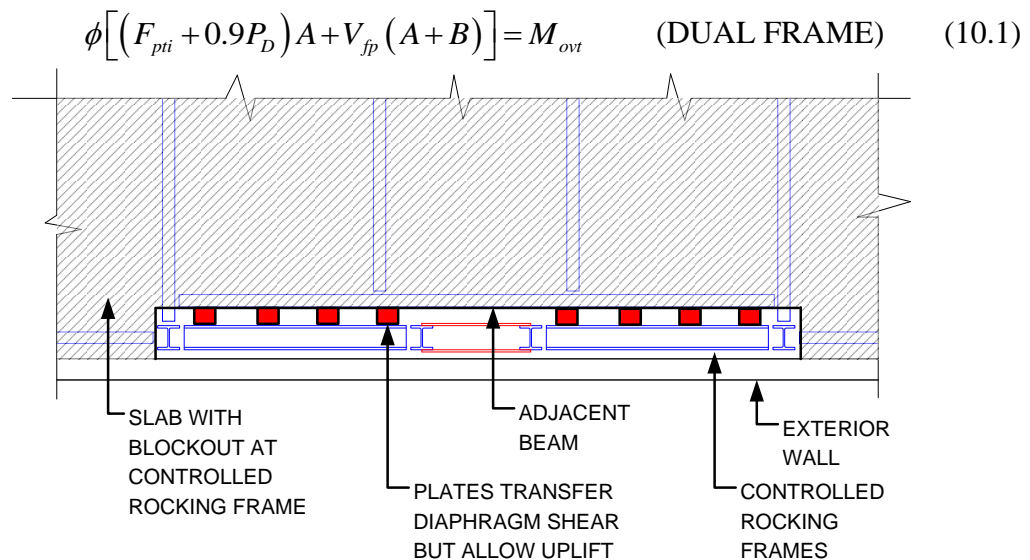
Plan View of Floor Connection to Controlled Rocking Frames Assumed in the Sensitivity Study
